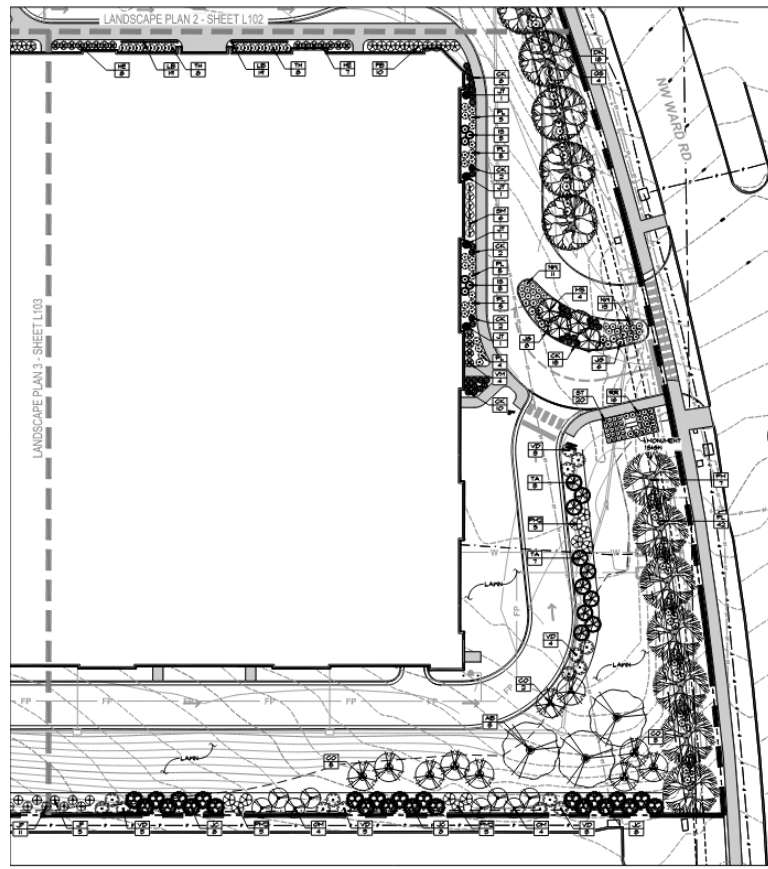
Landscape Plan (east side of Rush Funplex building along NW Ward Rd)
